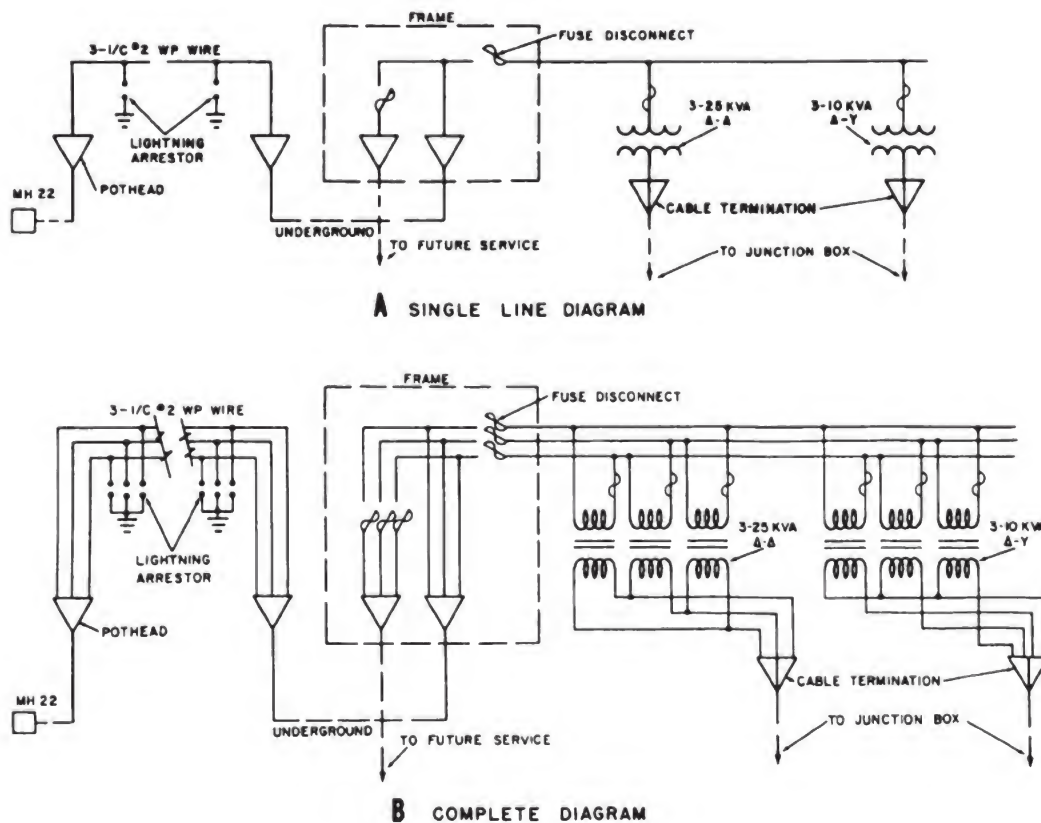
A. Single-line wiring diagram. B. Complete wiring diagram.
